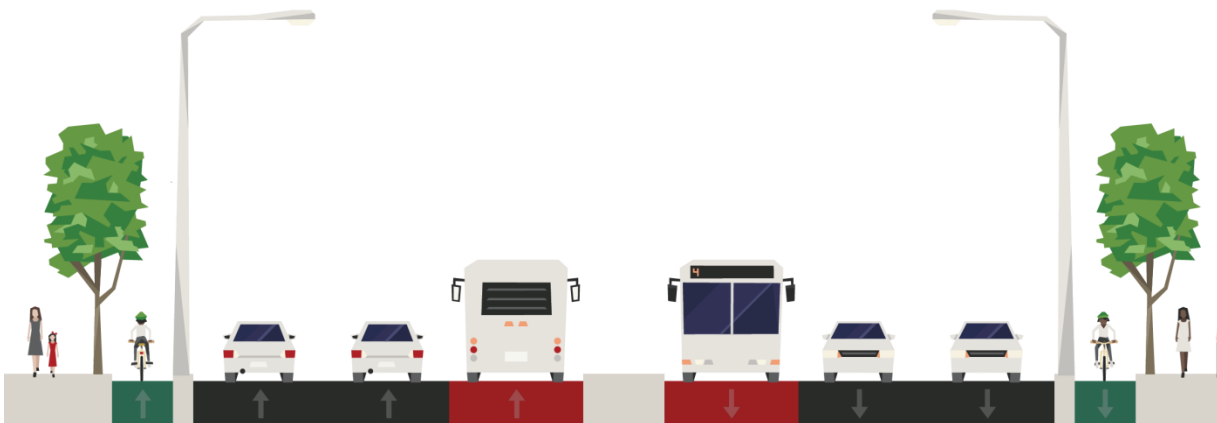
Proposed Long Term Street Cross Section in Doubleview, west of Odin Road
